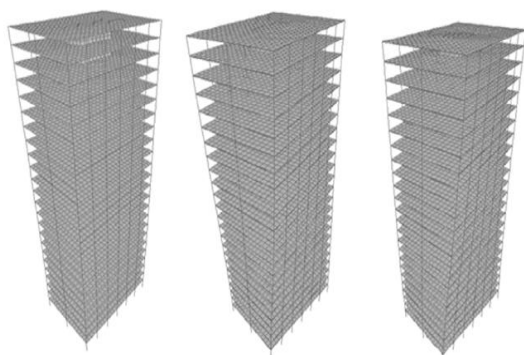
Typical deformed shape of a horizontal diaphragm.
